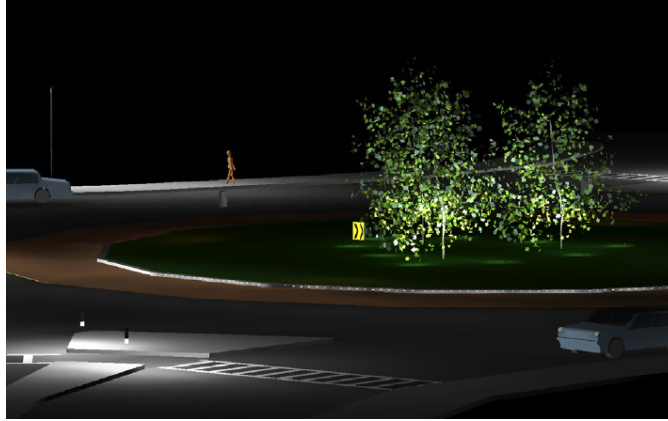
Isometric view of the roundabout rendering with pedestrian walking on the sidewalk. Notice that the pedestrian and sidewalk are well illuminated.
